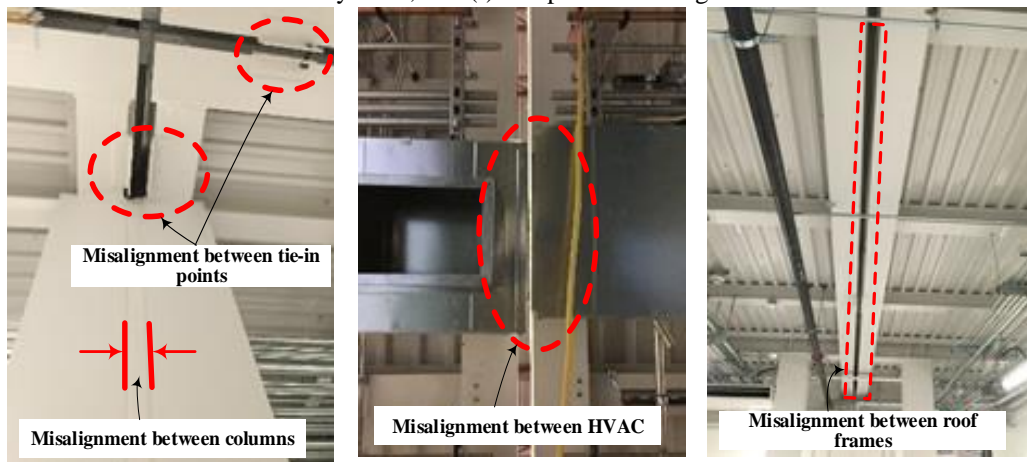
Misalignment issues between modules and their components during erection phase at project site.
